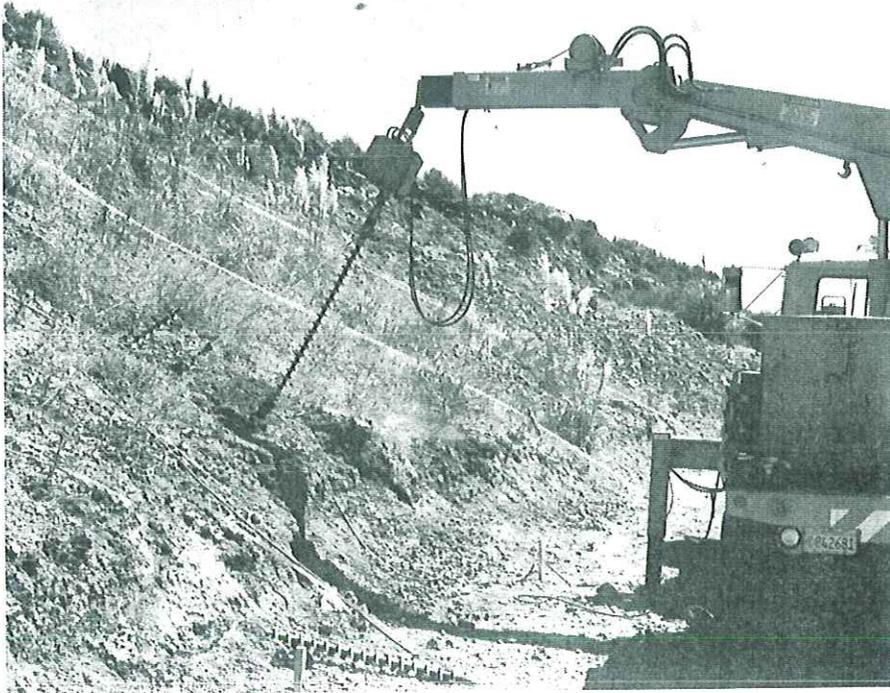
DRILLING ANCHOR FOUNDATION HOLES WITH 4-INCH CONTINUOUS FLIGHT AUGERS USING A HYDRAULICALLY POWERED TRUCK-MOUNTED ARTICULATED BOOM
